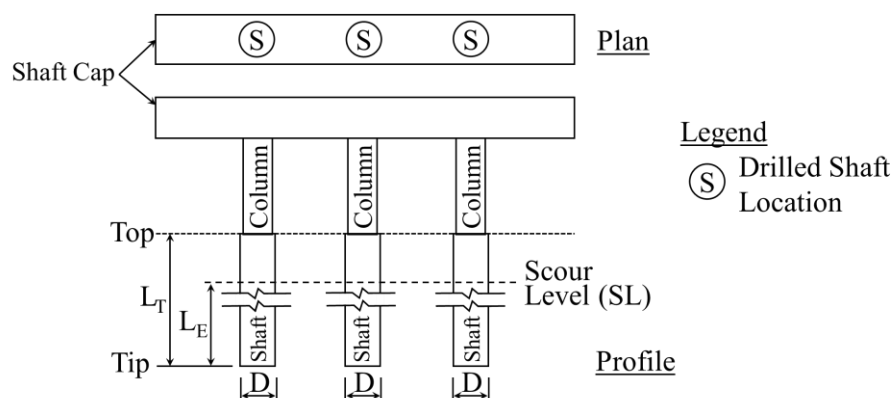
Schematic of drilled shaft configuration and dimensions at a given support.
